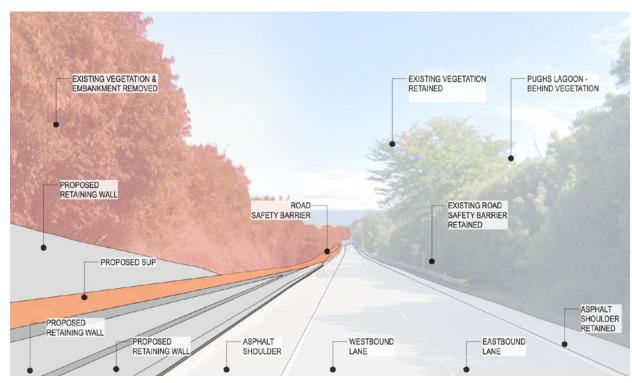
Viewpoint 5 - Proposed view on Kurrajong Road looking north towards Pughs Lagoon
